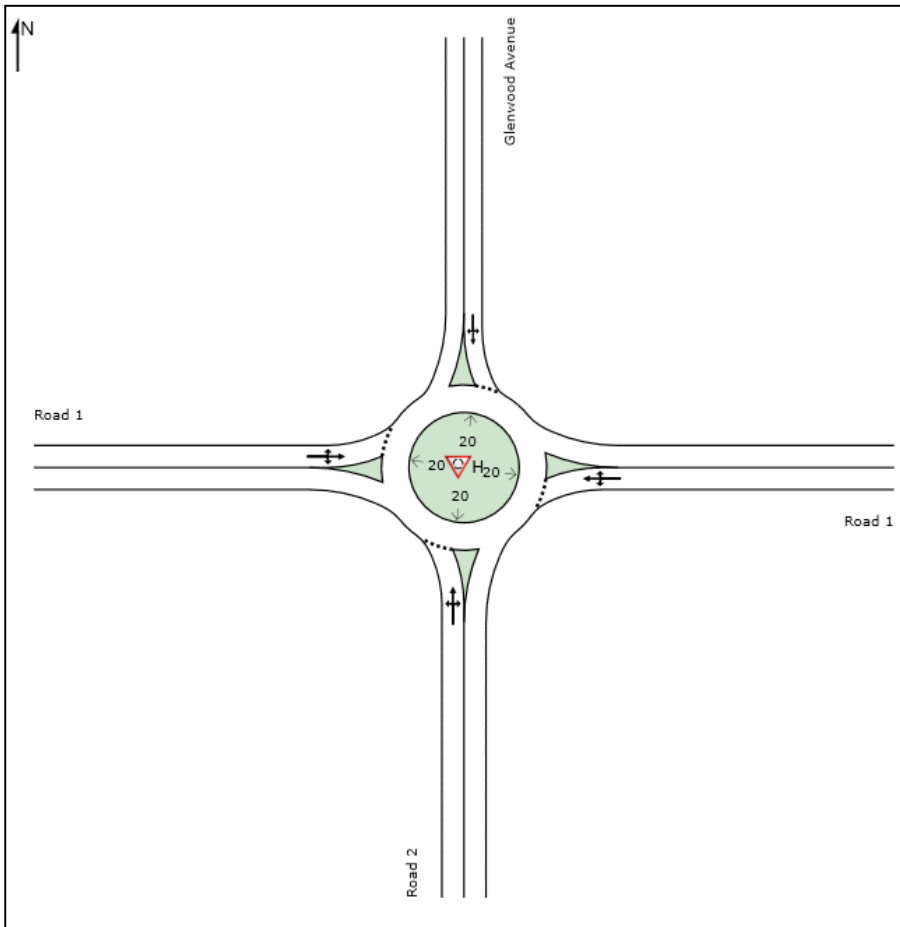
Intersection Layout: Road 1 and Glenwood Avenue
